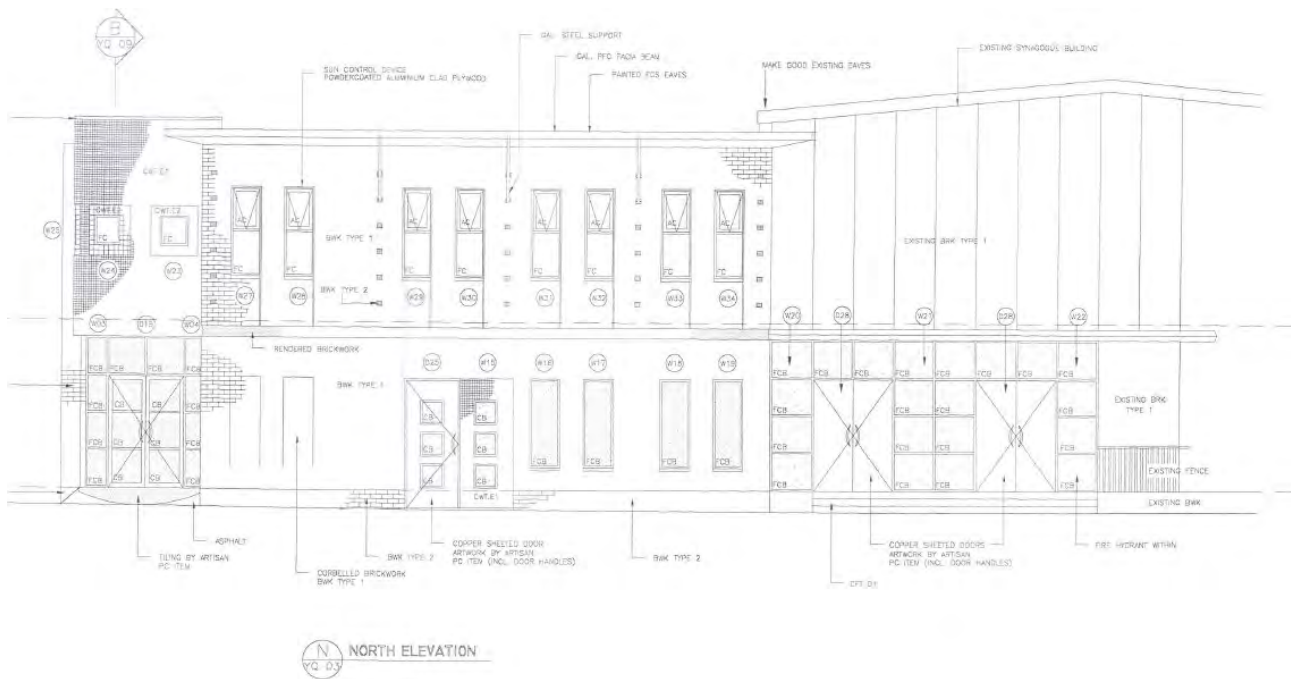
Drawing of northern elevation dated February 1996, Forward Viney Woollan (Source: Council Building File, B0364/1996/P/0-01)
